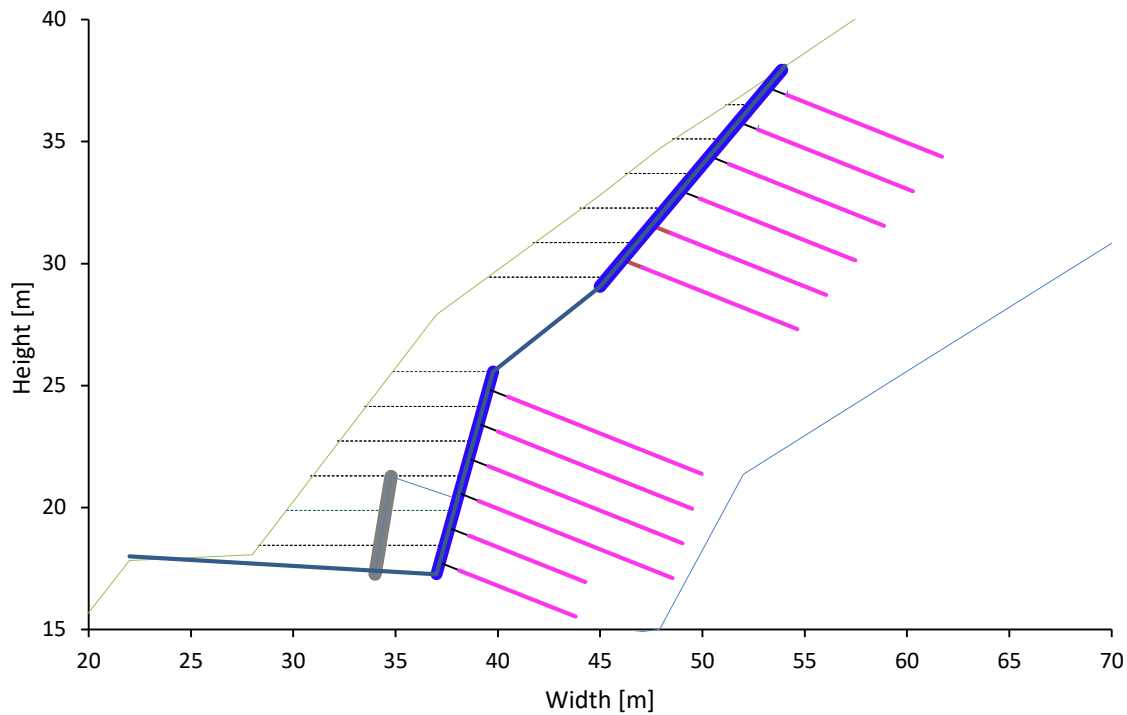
2: Sketch of the preliminary soil-nail configuration and excavation plan.
